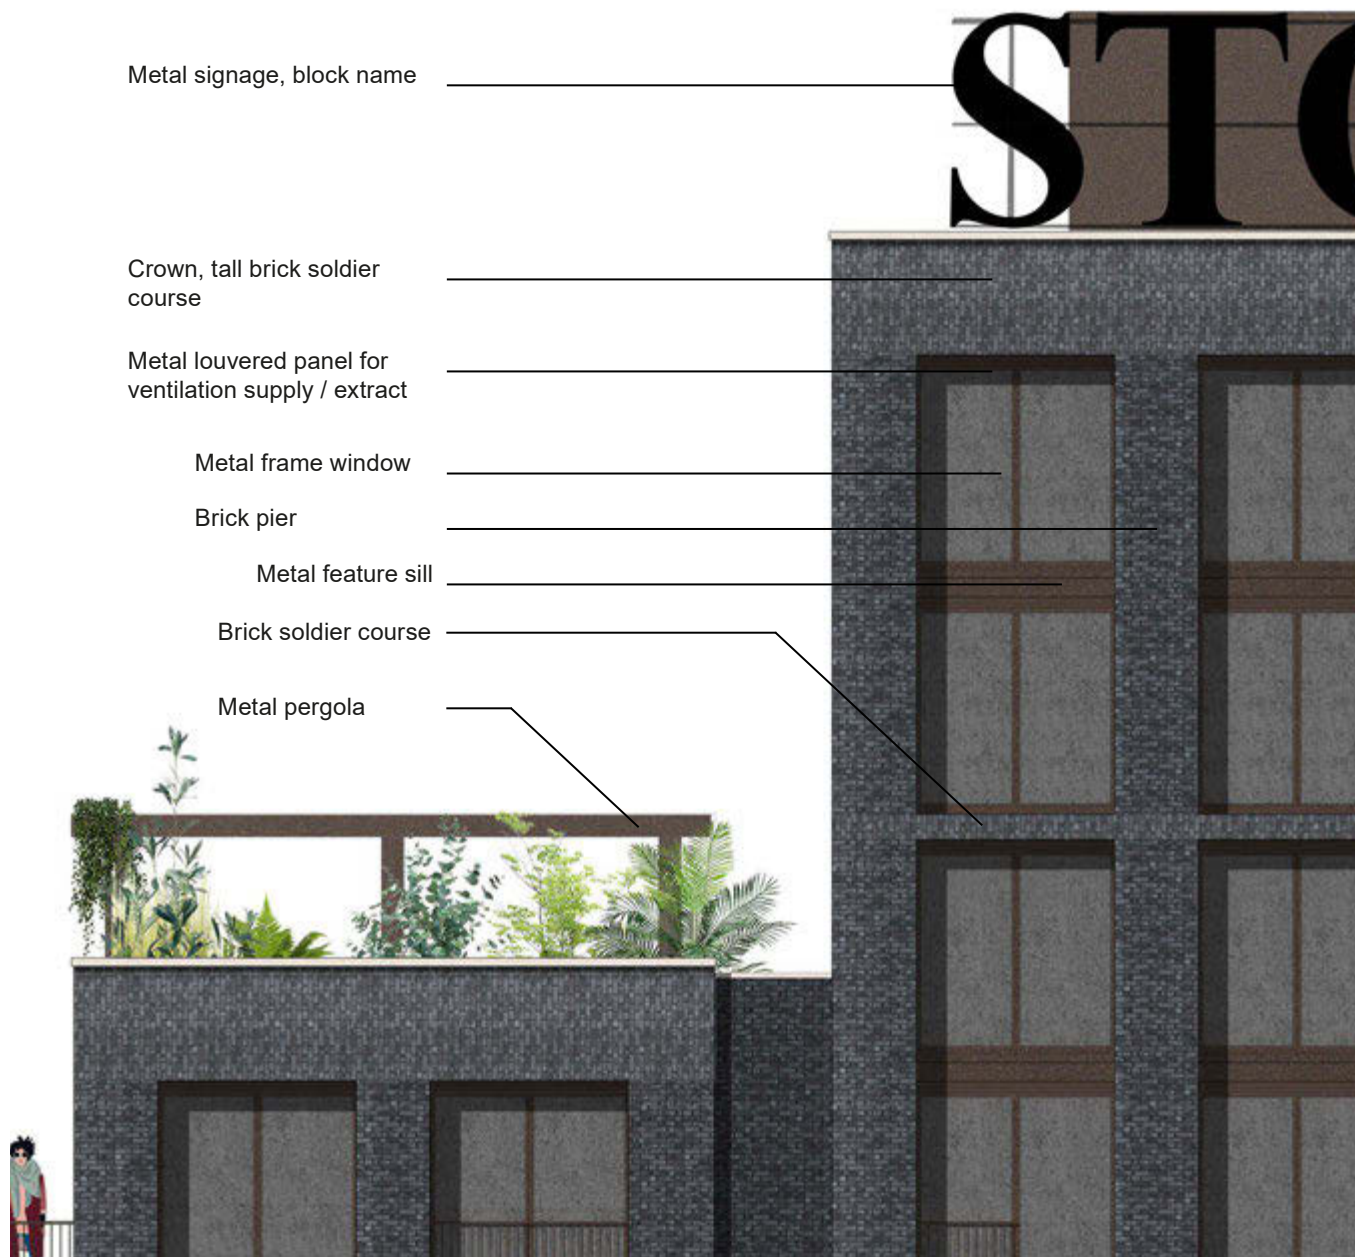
Illustrative fragment elevation - Middle Block B
